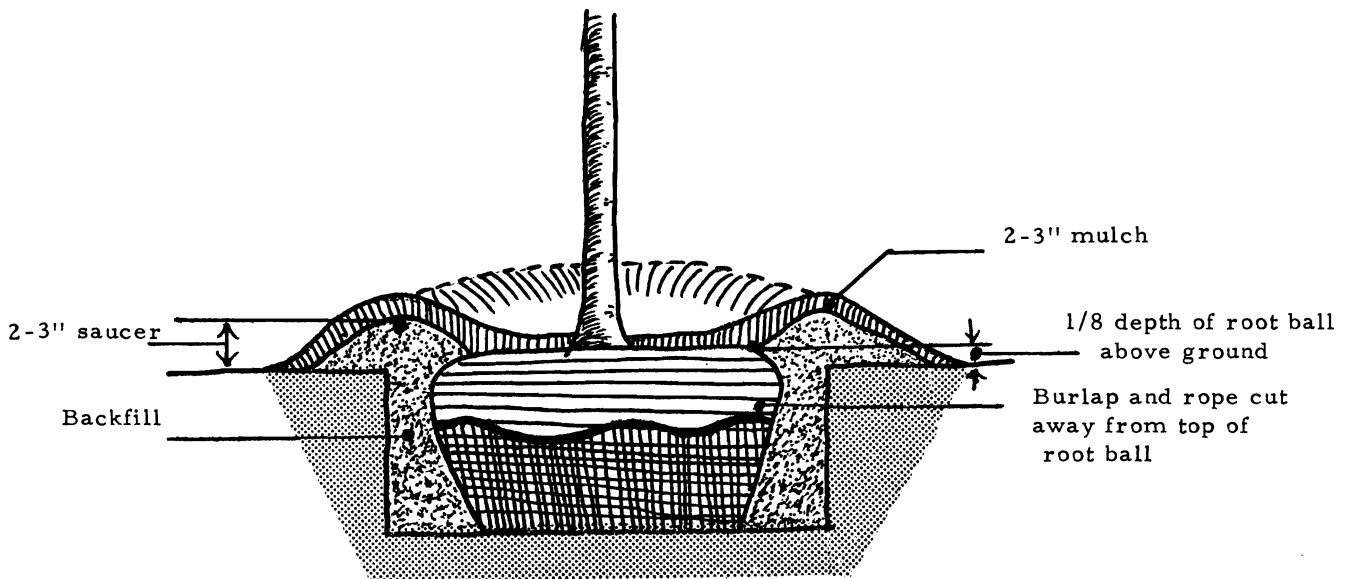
Planting directions for balled and burlapped plants. Planting hole should be dug so that 1/8 of the root ball is above ground without placing backfill beneath the root ball. Removal of the burlap and ropes from around the stem immediately at planting time and building the saucer with edges extending beyond the borders of the planting hole to exclude surface runoff.
